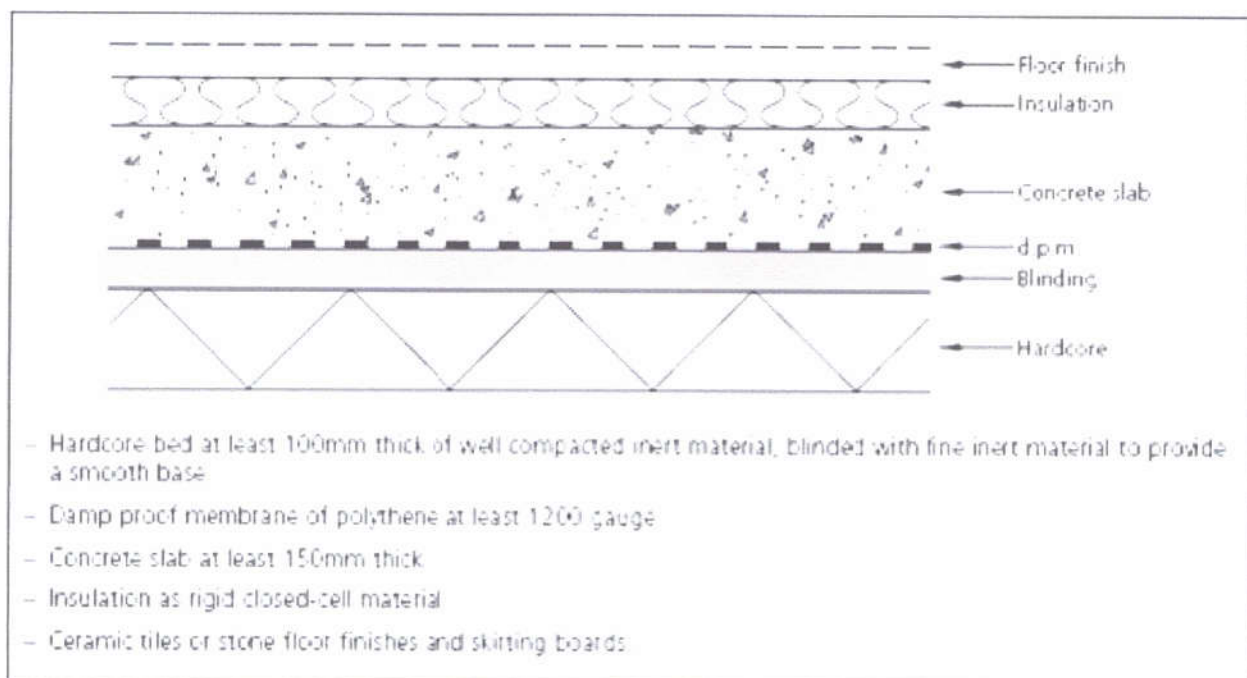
Ground-supported floor (Source: DCLG, 2007)
